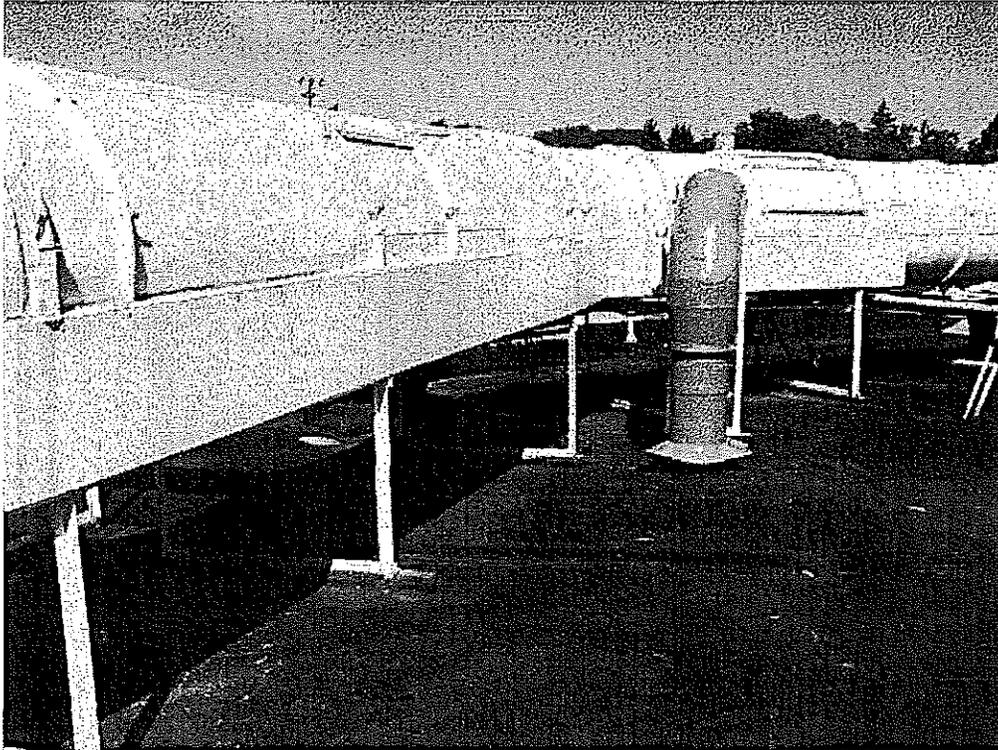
(Photo 9) : Looking north, at ductwork leading to scrubber No. 3.
